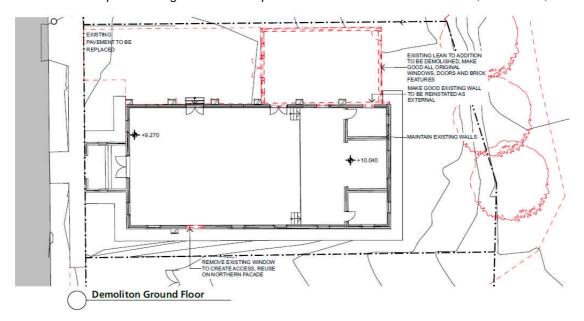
Hall plan showing the two areas of demolition work. (SHAC Sheet 2001)
